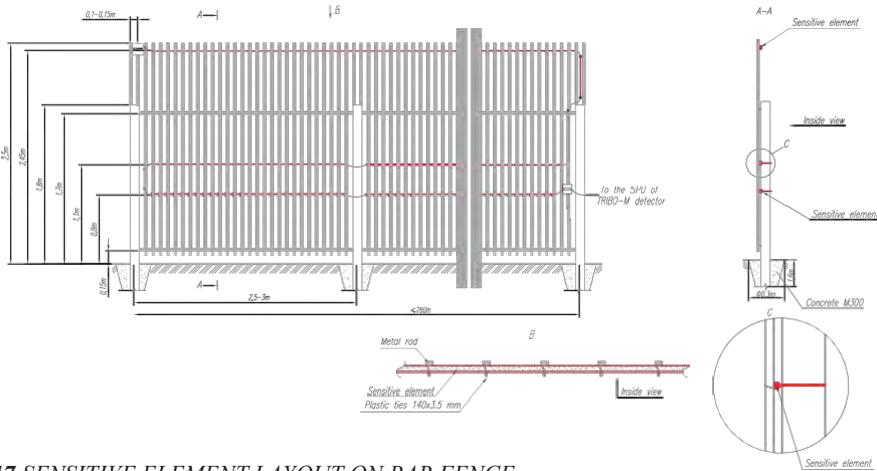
SENSITIVE ELEMENT LAYOUT ON BAR FENCE
